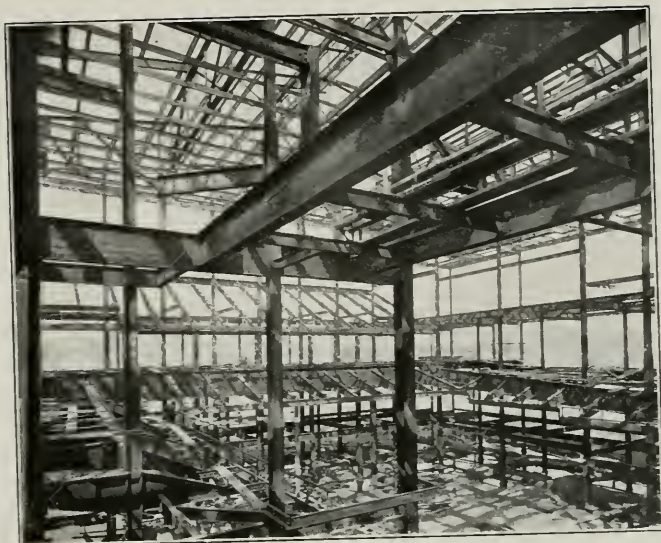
SHOWING STRUCTURAL STEEL WORK
